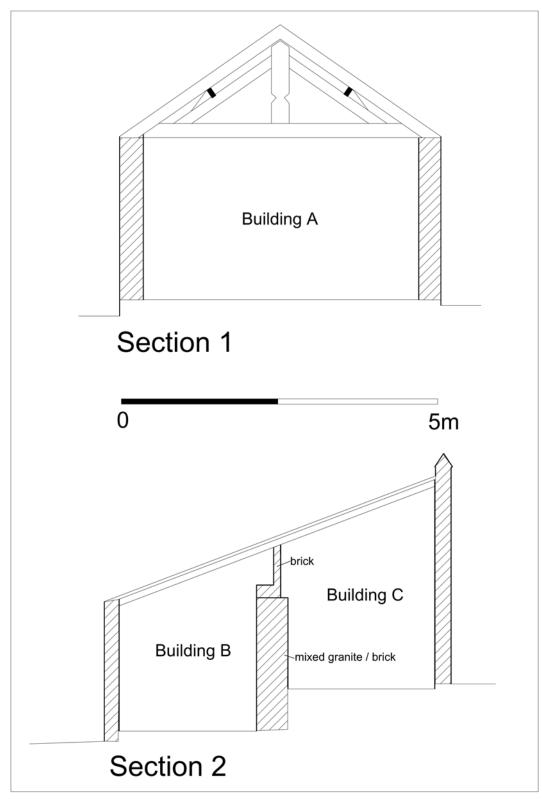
Section 1 (building A), and section 2 (buildings B & C)
